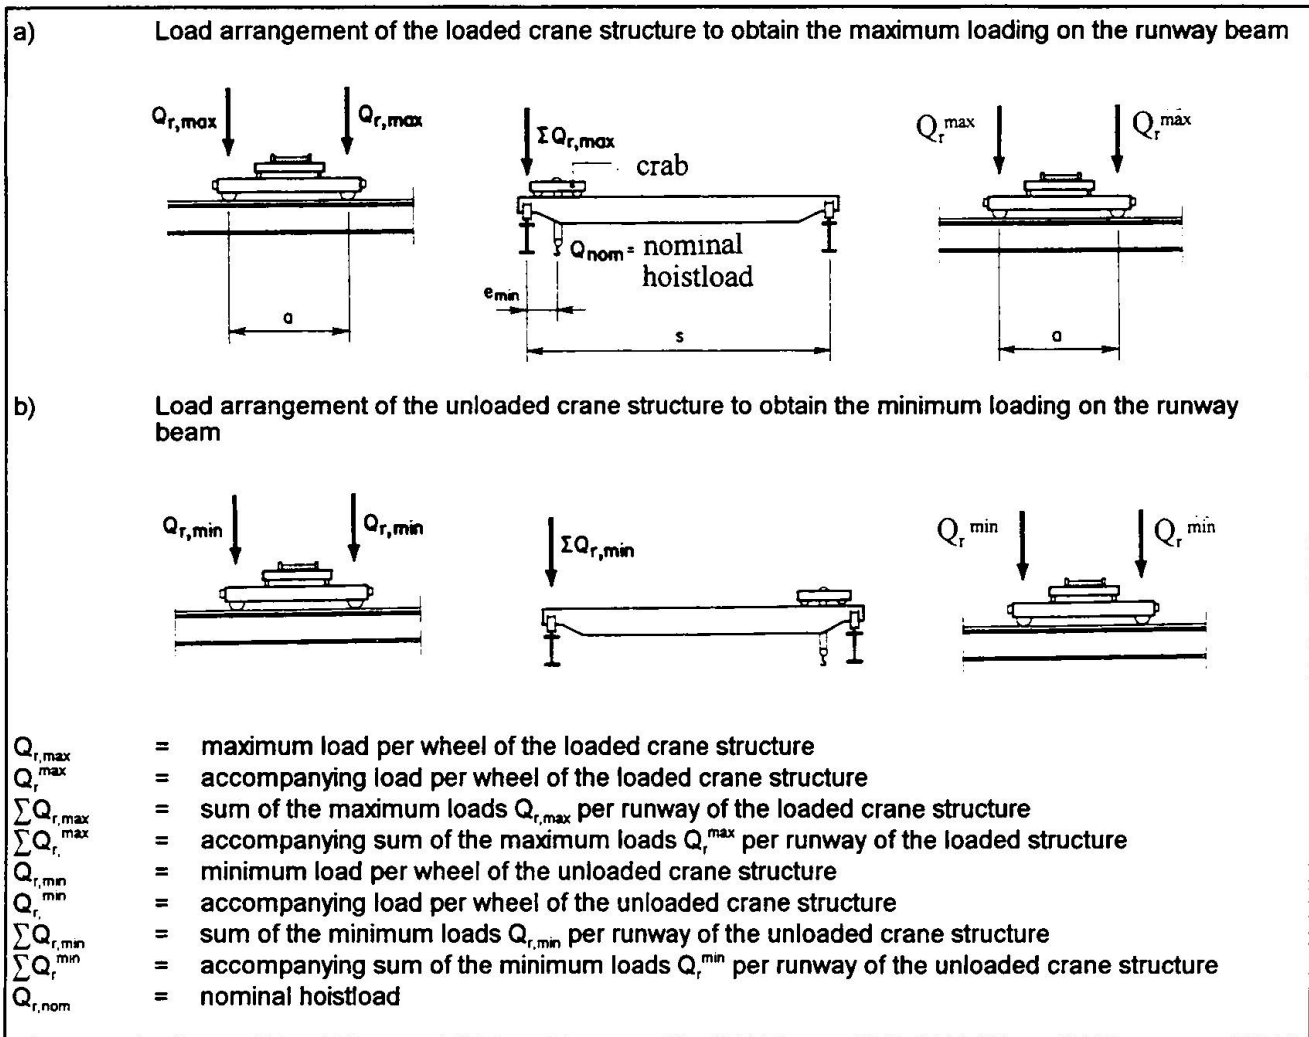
Load arrangements to obtain the relevant vertical actions to the runway girders
